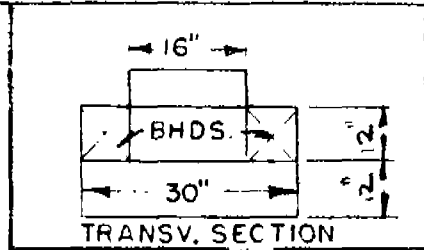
TYPICAL BULKHEAD AND DECK BEAMS
